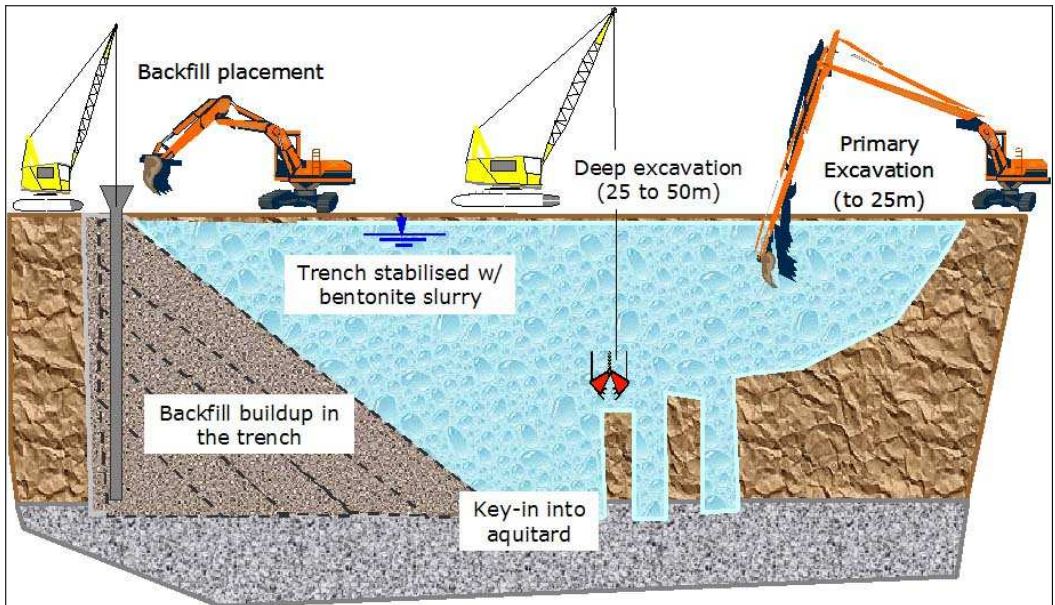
Schematic of deep soil-bentonite wall construction process
